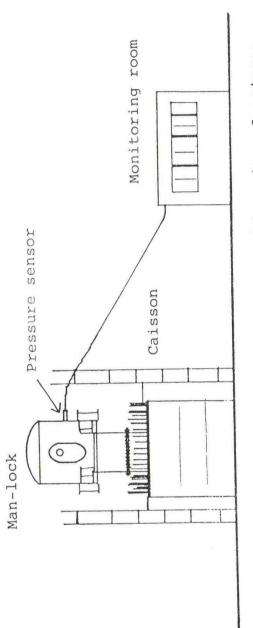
Use of DPRS-2 at the construction site of caisson.
